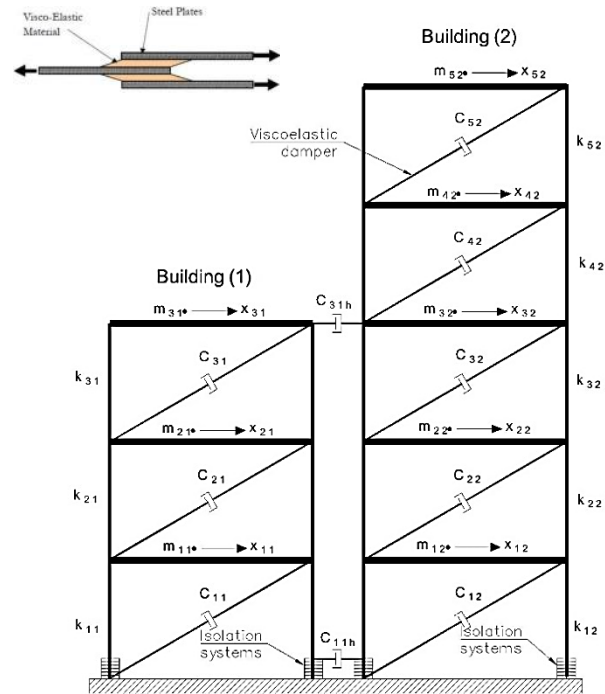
shows the two structural models under consideration, depicting multi-degree-of-freedom shear models with rigid floors. Fig. 1(a) shows the I-story base isolated building connected through viscoelastic dampers at different floors to the adjacent story base isolated building. In Fig. 1(b), a similar viscoelastic damper connected system with the story base isolated buckling mounted on various isolation systems connected to the adjacent m-story fixed base building is shown, along with the schematic of a typical viscoelastic damper. The masses in these models are assumed to be lumped at each floor level, and the stiffness is provided by axially inextensible massless columns. Both the adjacent connected buildings are assumed to behave linearly elastically and receive the same earthquake ground motion horizontally. The soil structure interaction effects are not taken into consideration. For both buildings, the mass at all floor levels is kept constant while the stiffness is varied to achieve the desired fundamental periods under a fixed base condition. These adjacent buildings are connected at different floor levels by linear viscoelastic dampers to serve as an energy dissipation mechanism.
